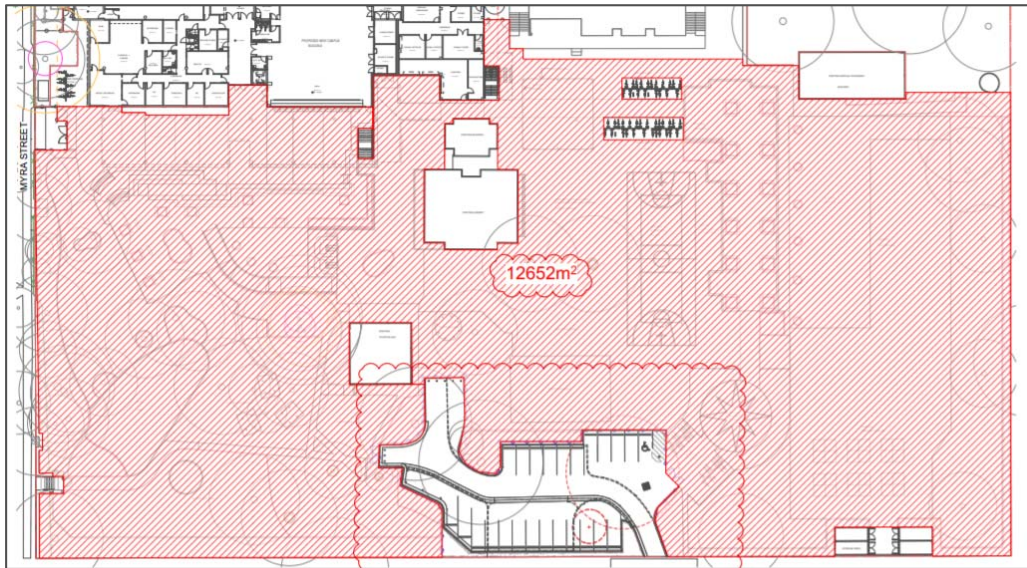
| Proposed play area - 12, 652 square metres (Source: Applicant's modification application 2020)
